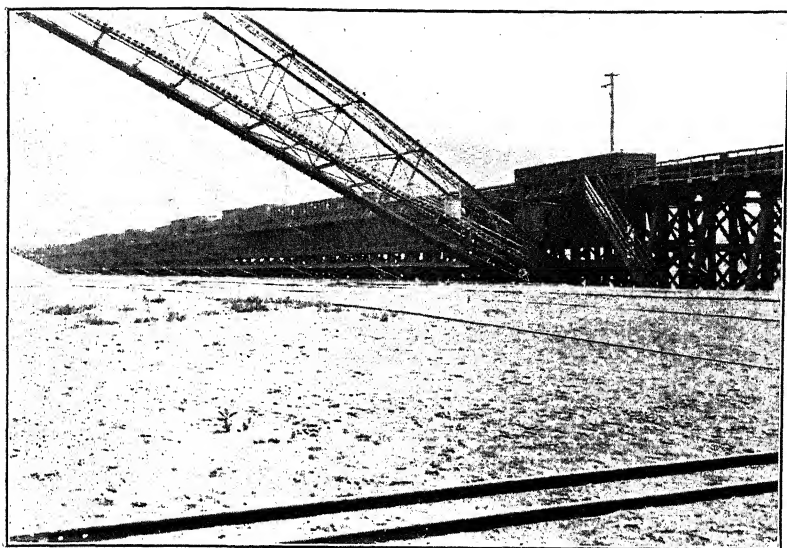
RANSOM PLANT. STOCKING-TRESTLE, SHOWING BINS, CHUTES, AND END OF TRAVELING-TRIMMER.
